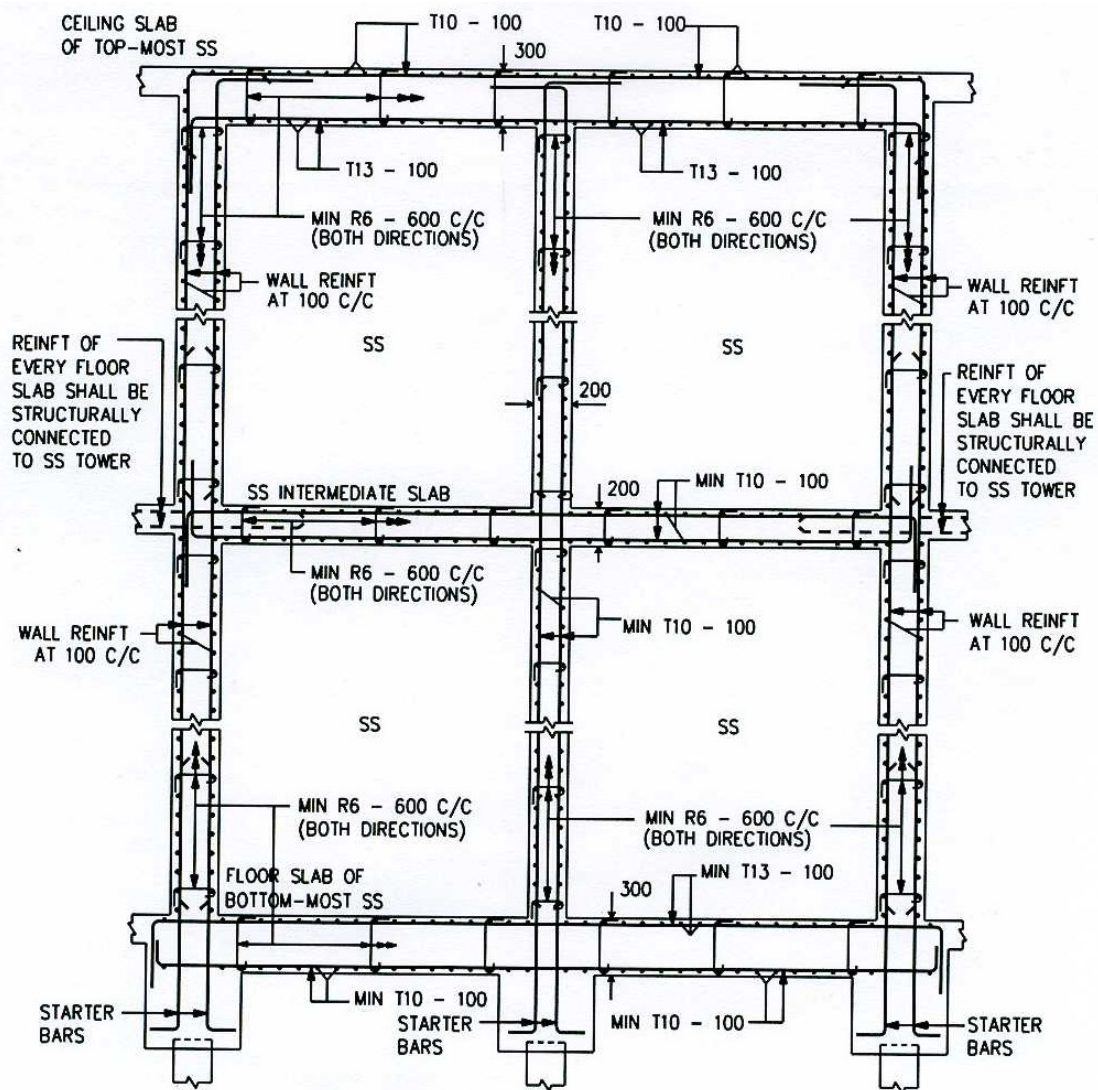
(b) TYPICAL DETAILS OF SS SLABS/WALLS
